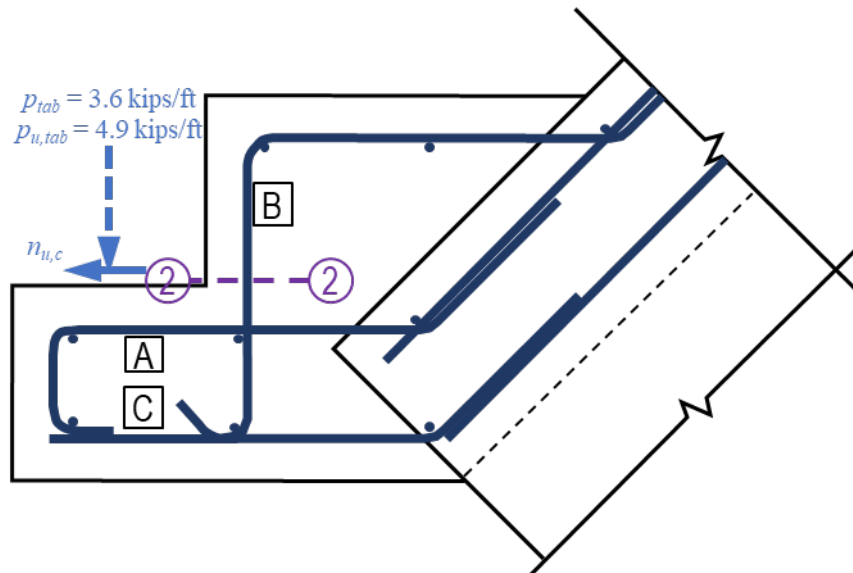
Design forces and critical location for Bar B “hanger” reinforcement
